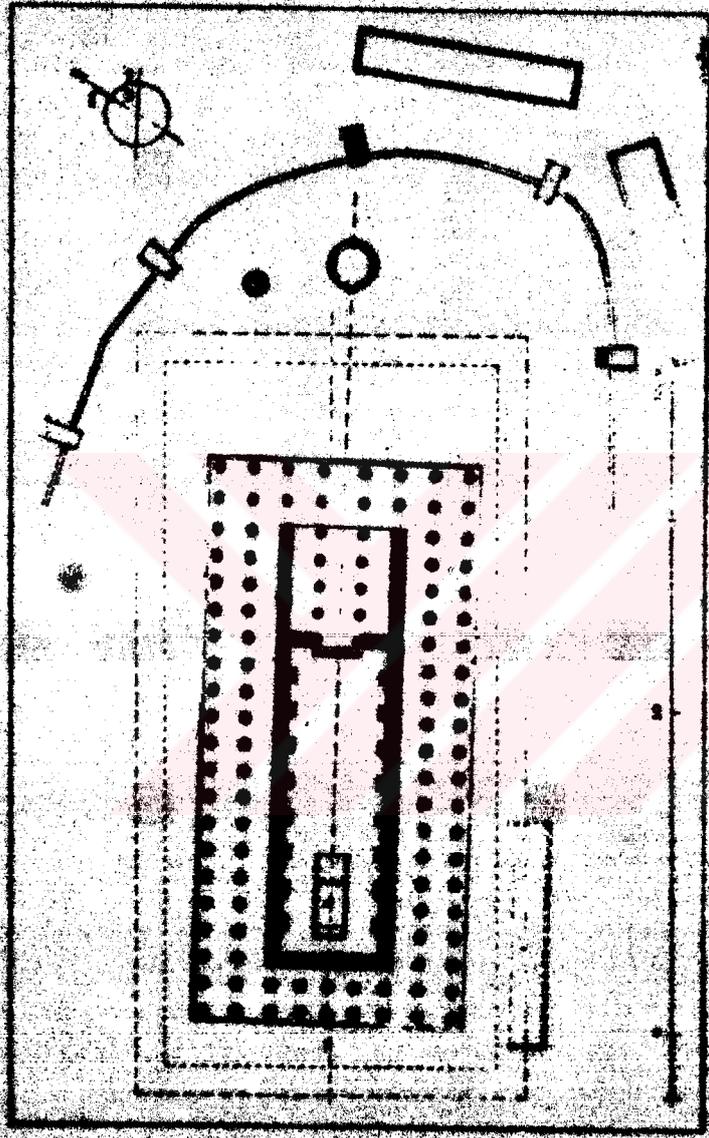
Archaia Temple of Apollo. Reconstruction of the plan.
